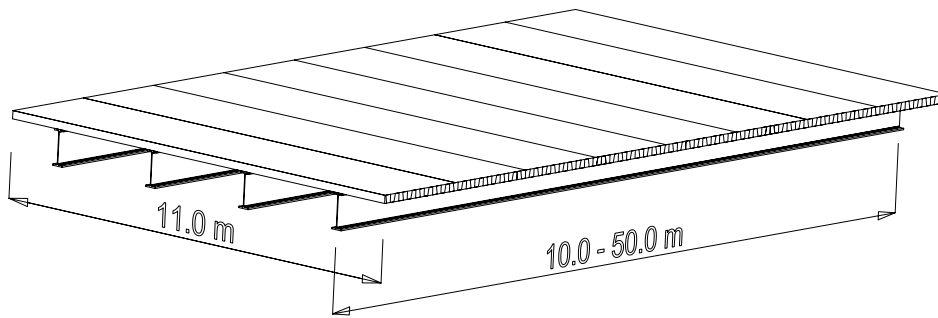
Layout of three-lane road bridges: steel girders with adhesively-bonded FRP bridge deck, girder spacing 3.0 m
